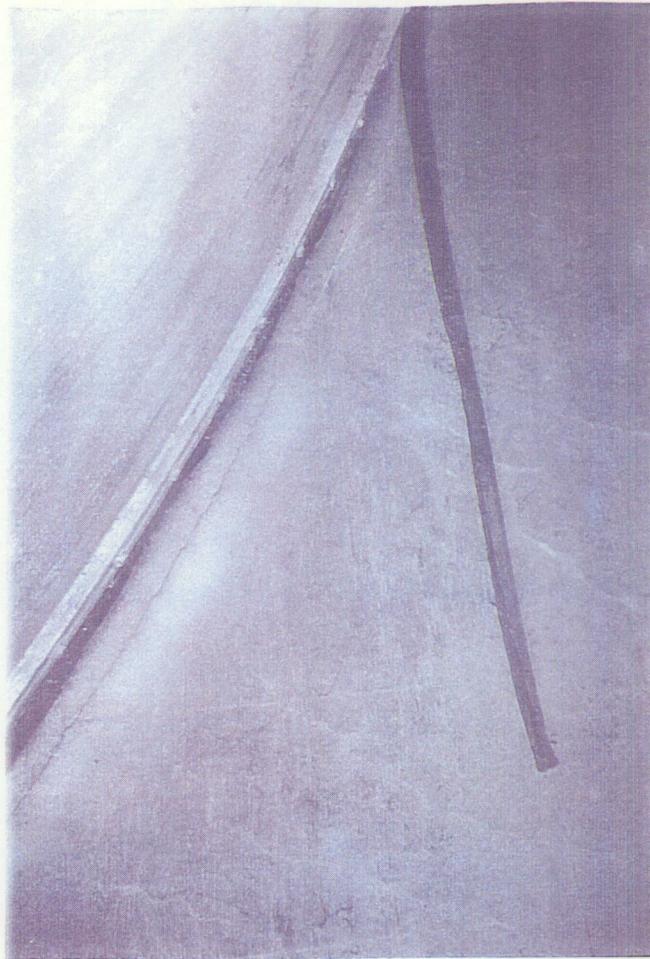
Morris Dam - 70' x 18' Drum Gate #1 - Upstream side of gate chamber, right end of upstream faceplate, right end chamber wall and right side end seals. Note music note seal rotted and bulb torn from stem.- (9/10/98).
